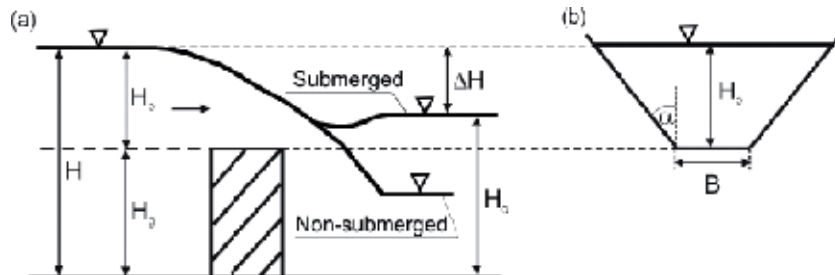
Hydraulic scheme and cross-section of a trapezoidal weir [4]. (a) Hydraulic scheme of weir, and (b) Cross-section of weir.
